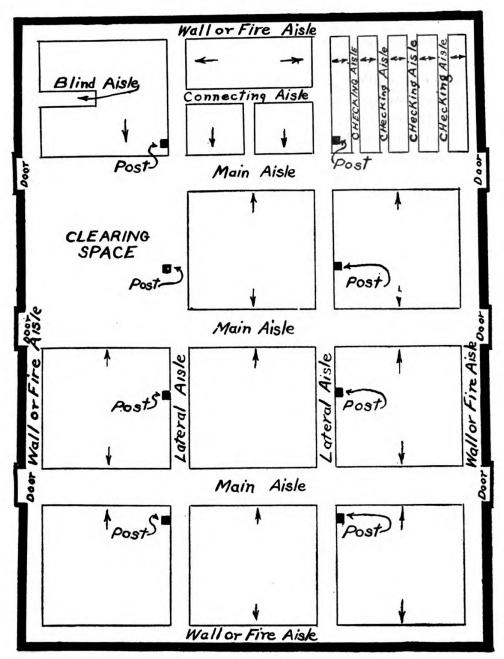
Floor plan showing a typical aisle arrangement in a warehouse.
